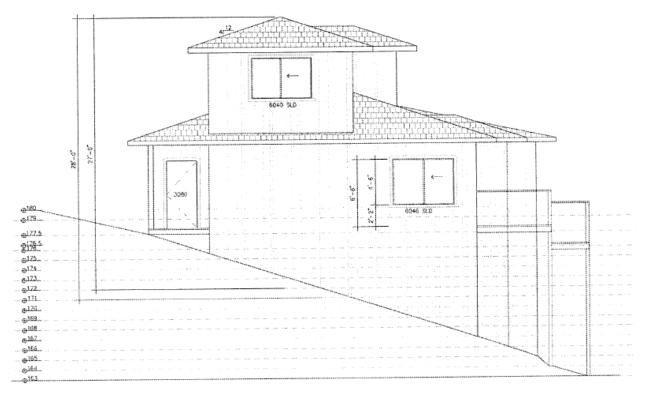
(West/Bedroom Elevation, Detail from Prior Residence Building Plans Sheet A3.02)
